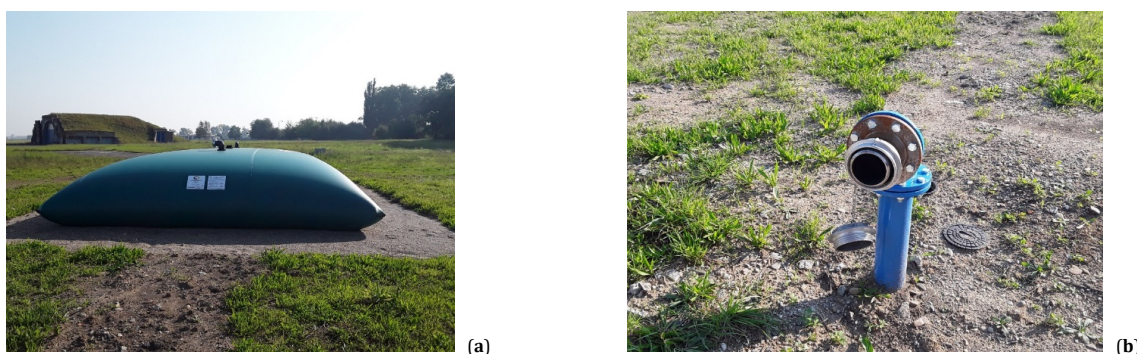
(a) Rubber textile bag and (b) Rubber textile bag - tank opening - suction flange.
